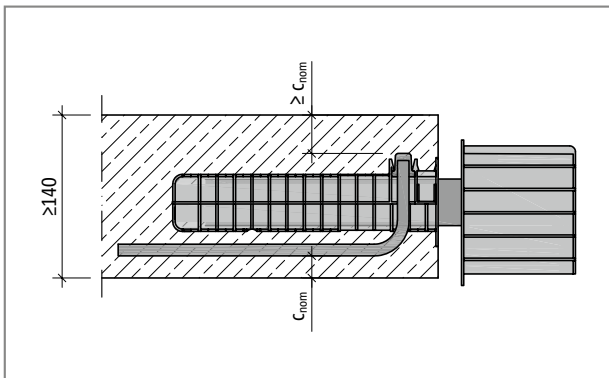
Schöck Tronsole® type Q: Installation with slab thickness $h \geq 140$ mm taking note of the concrete cover c_{nom}
